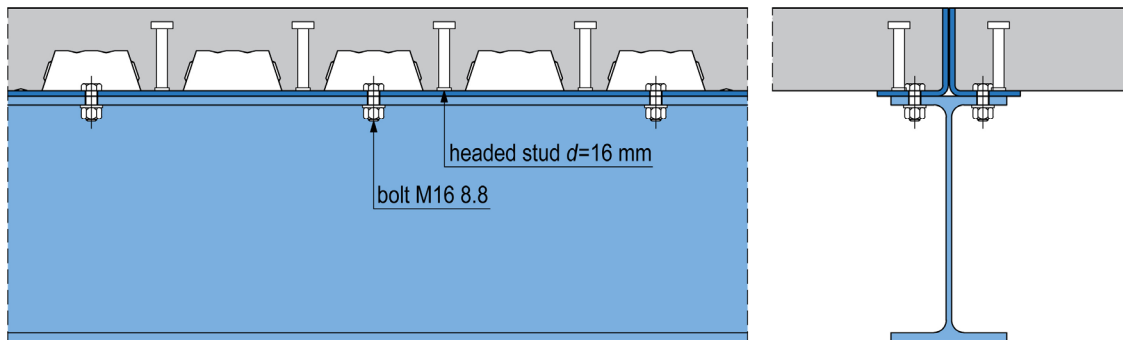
Layout of the demountable shear connection with profiled steel sheeting Cofraplus 60.
